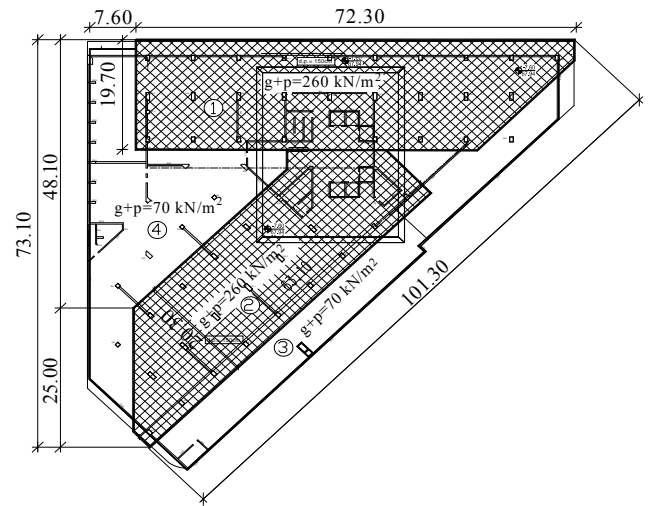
Plan of building New Energy Business Centre of the Electricity Board
